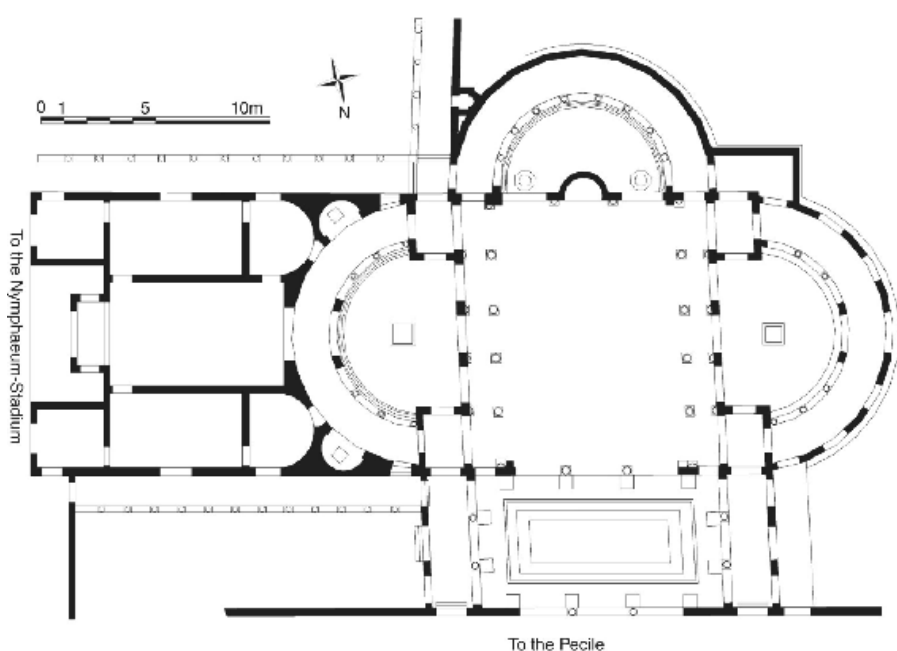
Hadrian's villa (Tivoli). Reconstructed plan of the Building with Three Exedras. Redrawn by author from Kähler (1950, tab.9).
